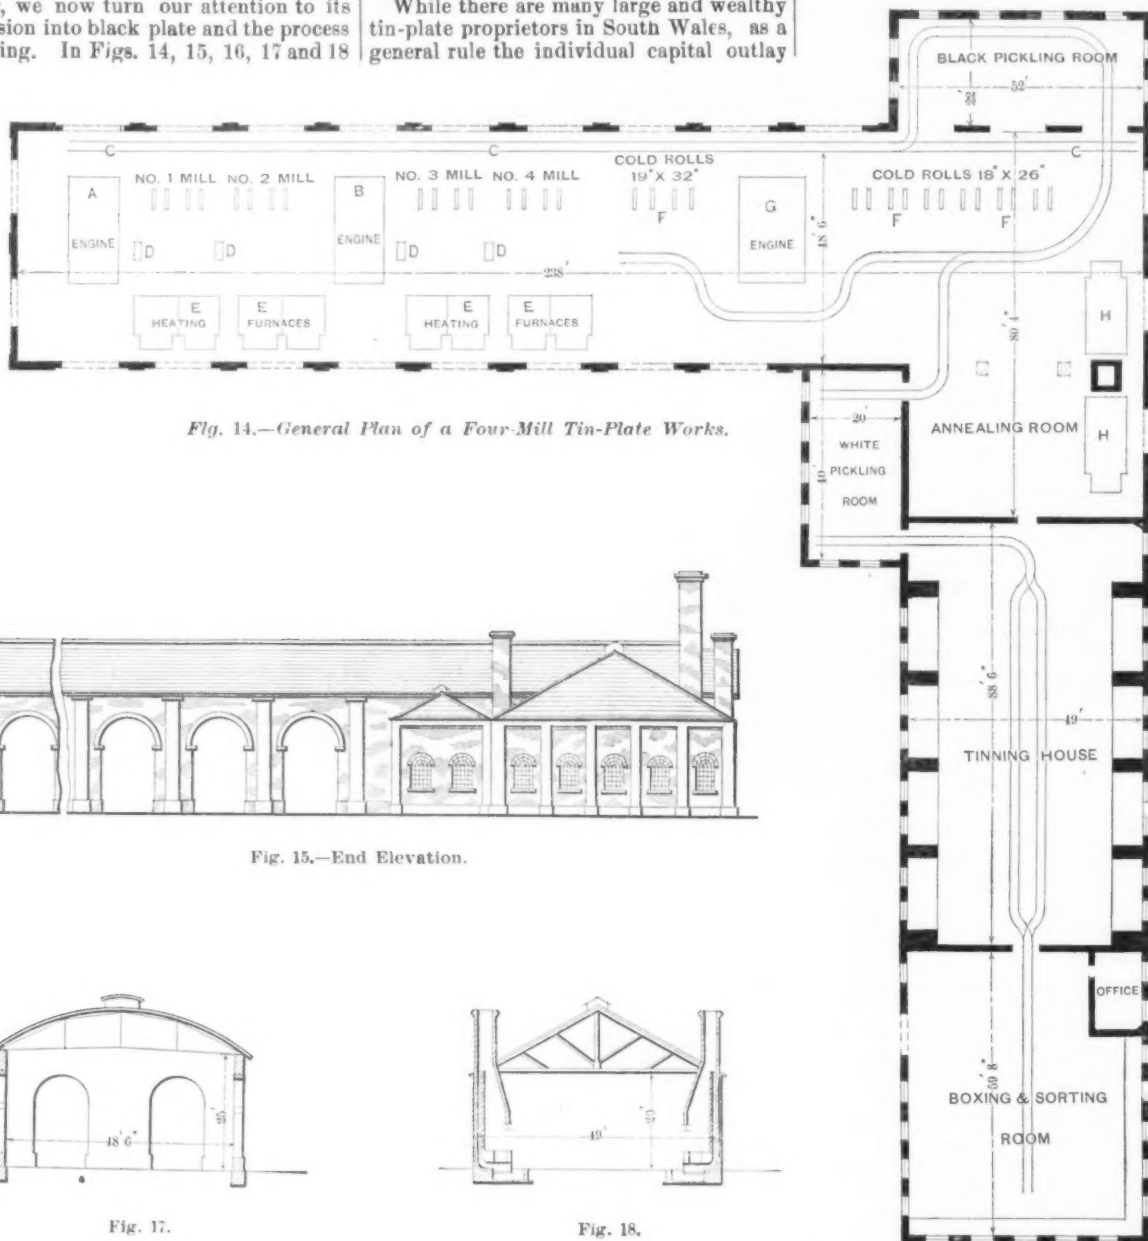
General Plan of a Four-Mill Tin-Plate Works.
